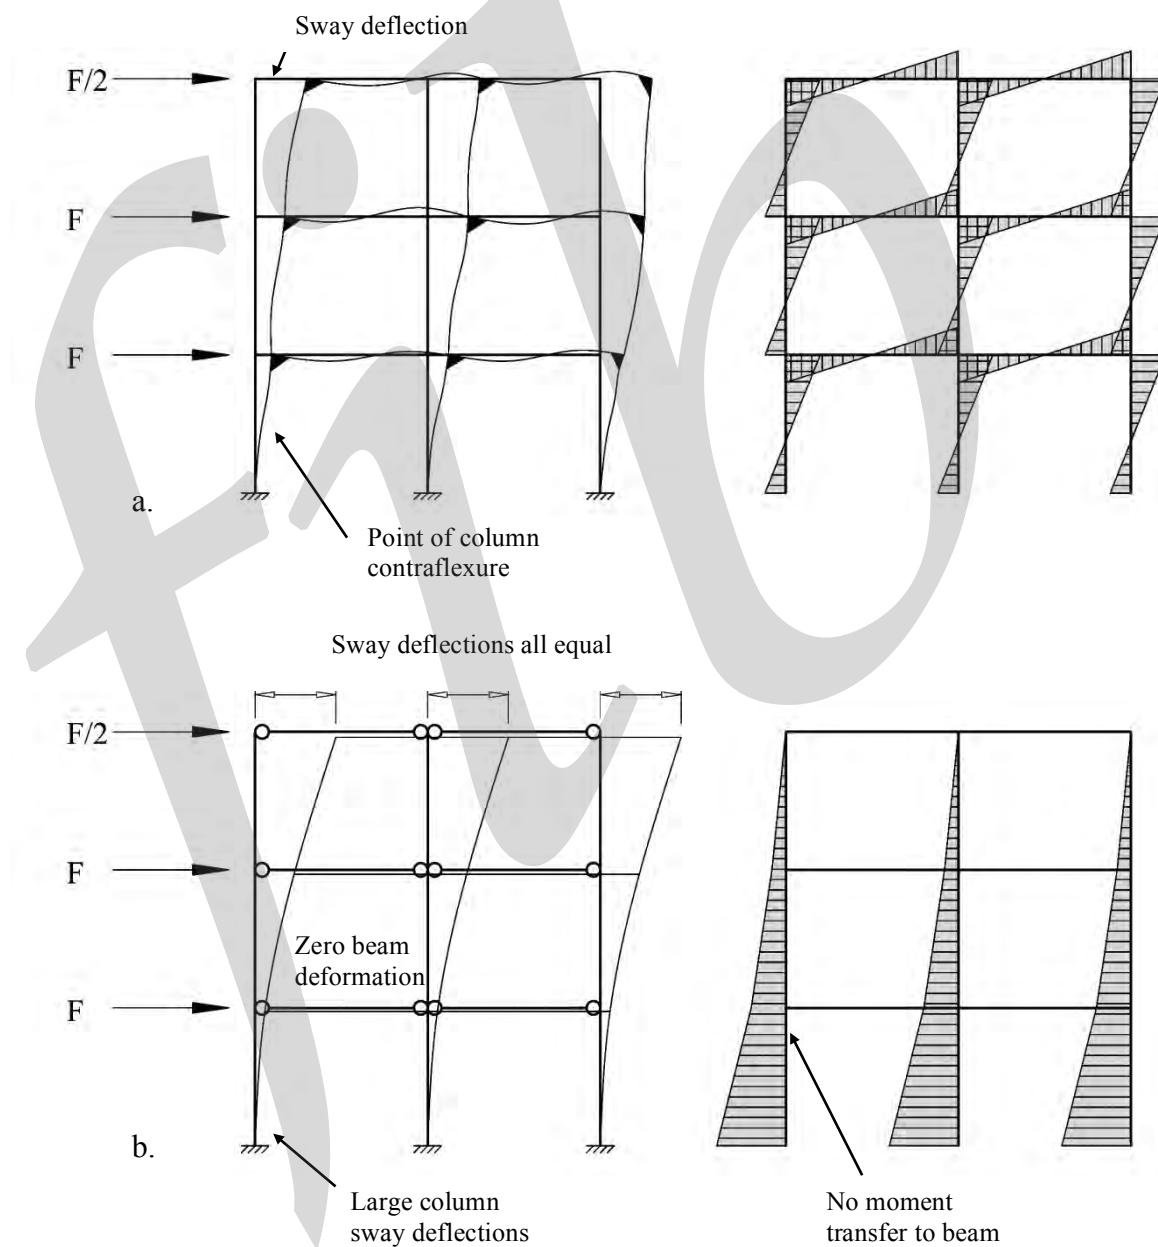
2-D and 3-D continuous frame action in cast in-situ frames is replaced in Fig. 1.6b by moment-resisting columns in a precast skeletal frame
